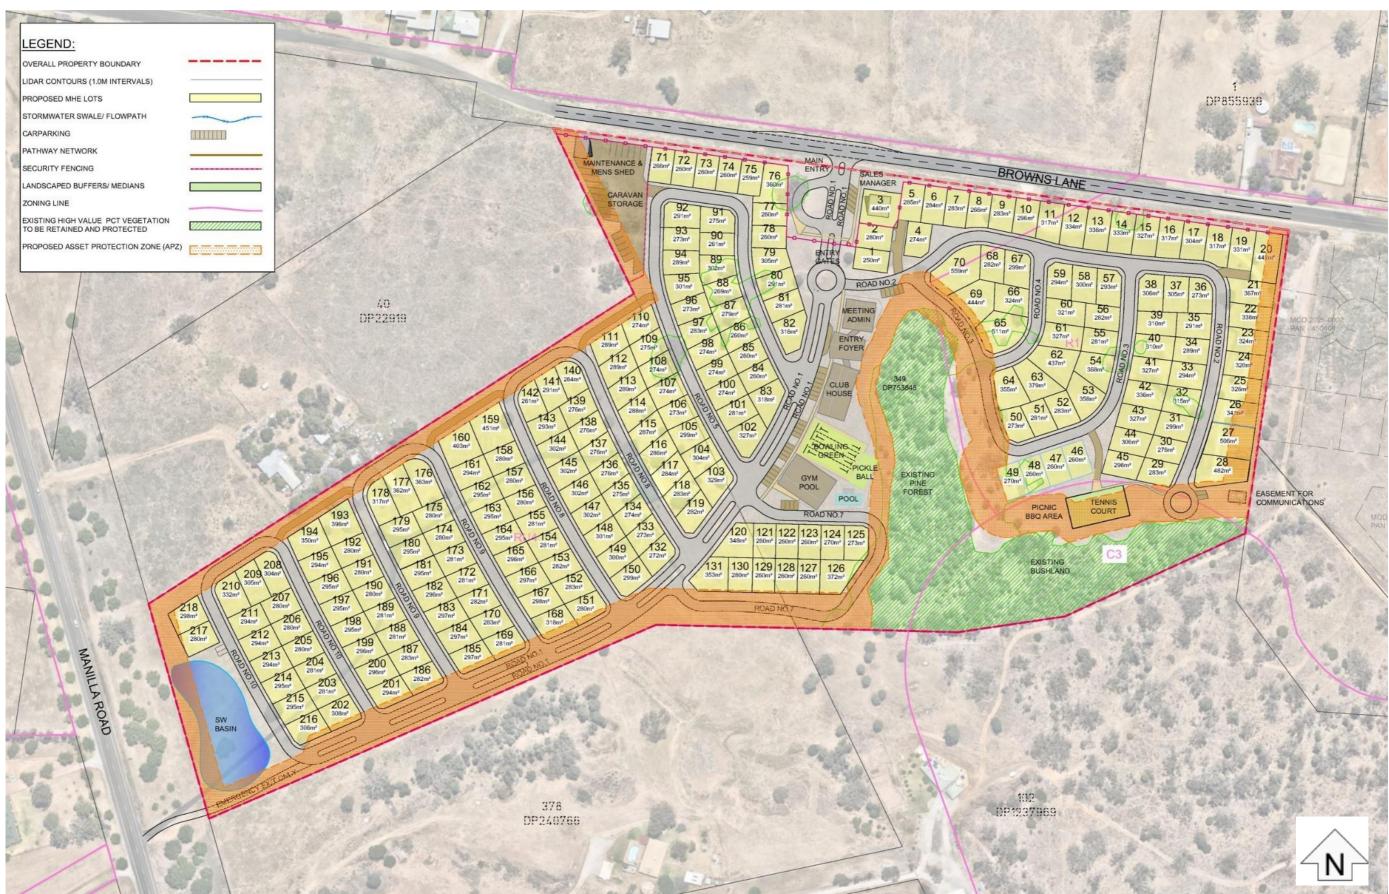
Site Layout Plan Extract Source: LDA. Not to scale.
